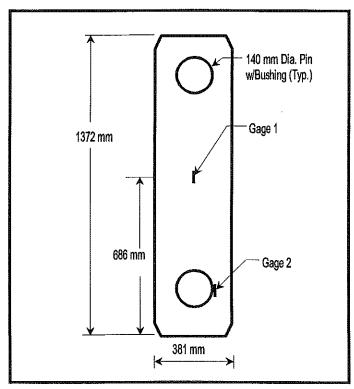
Span 10, Pier 10, West Fascia Beam. Link Plate Showing Strain Gages.
